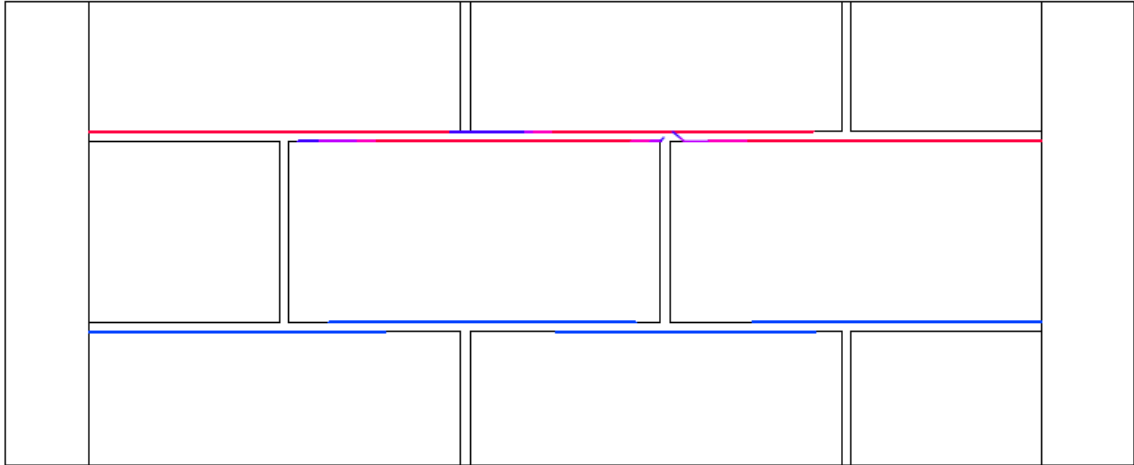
Close-up of Crack Pattern of B-1 2.2m Wall
